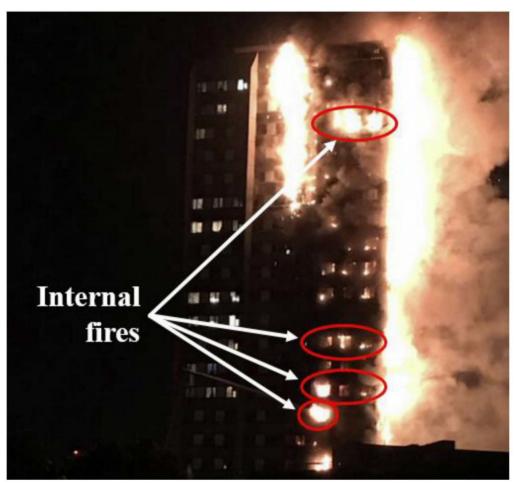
Internal fires at 01:52, photograph of East elevation of building (MET00012593)
